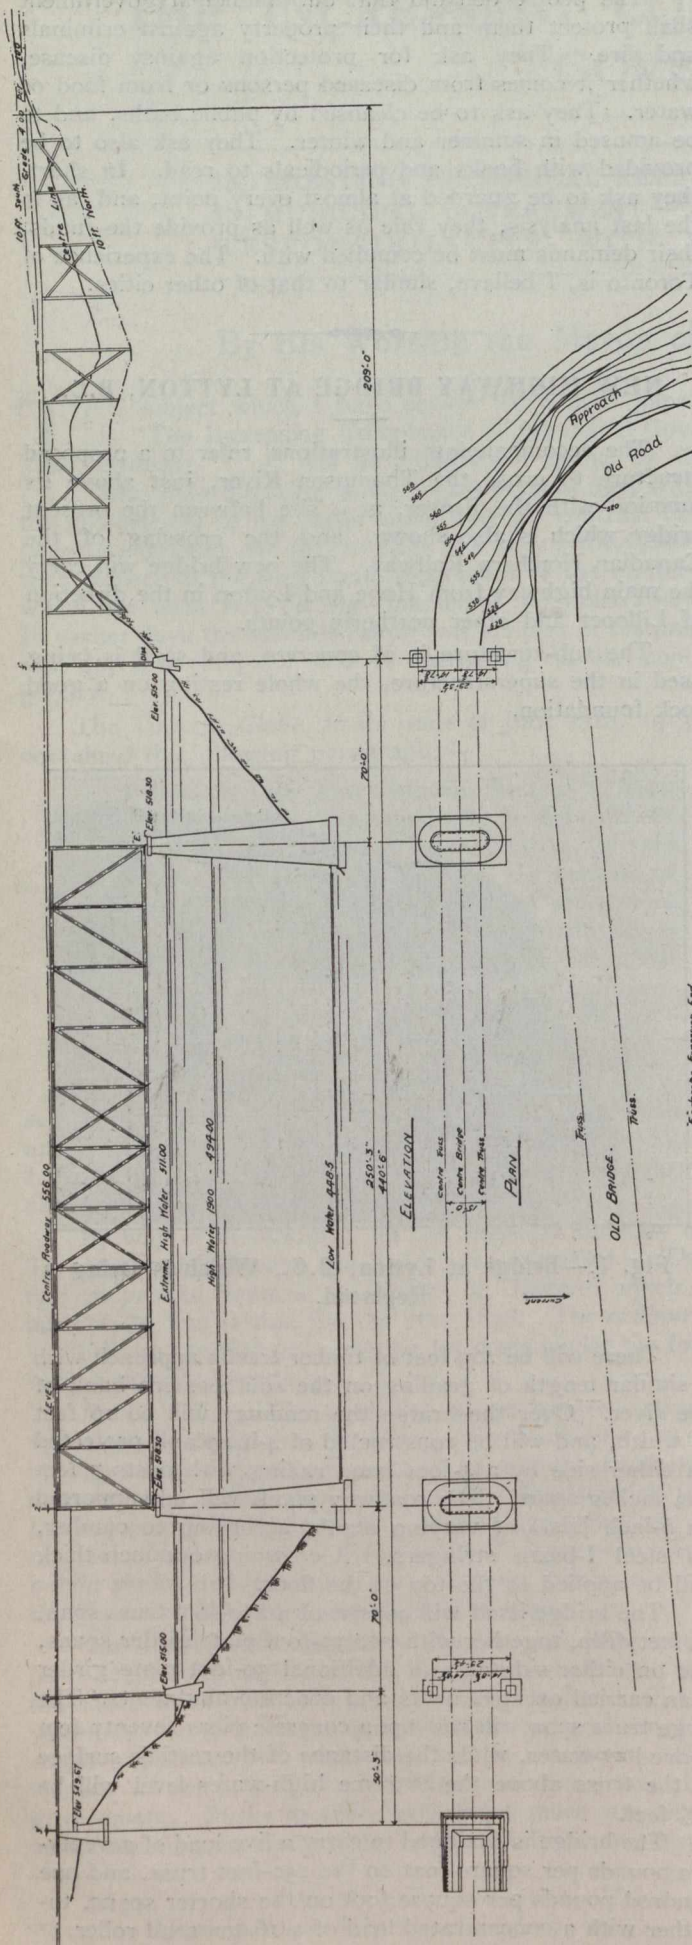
General Plan of Proposed Bridge Over the Thompson River at Lytton, B.C.
